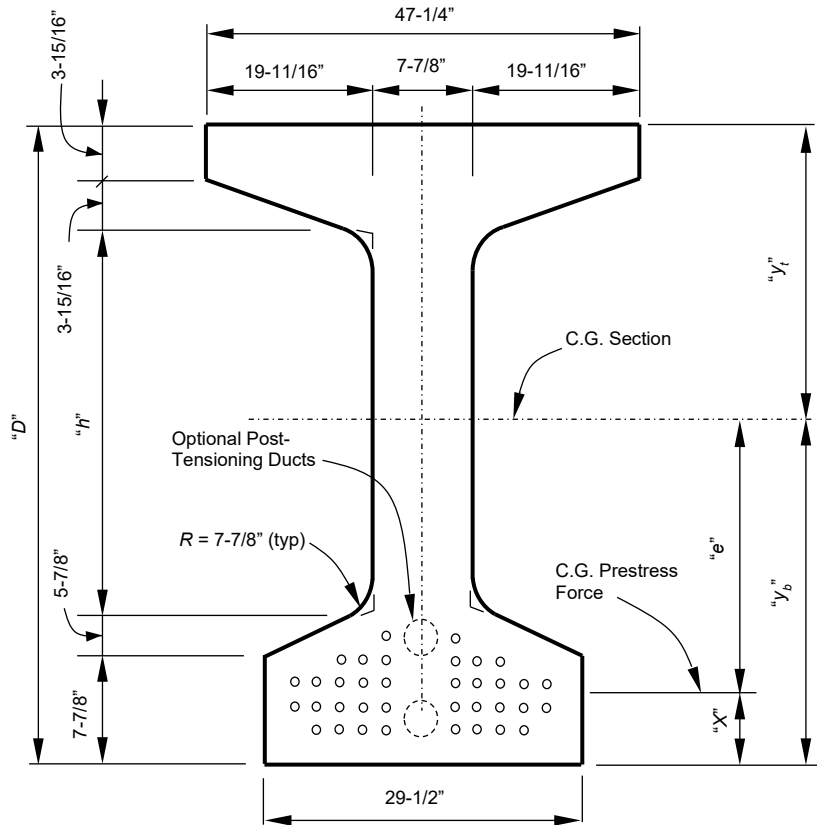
California Standard “Bulb-Tee” Girder Typical Section
